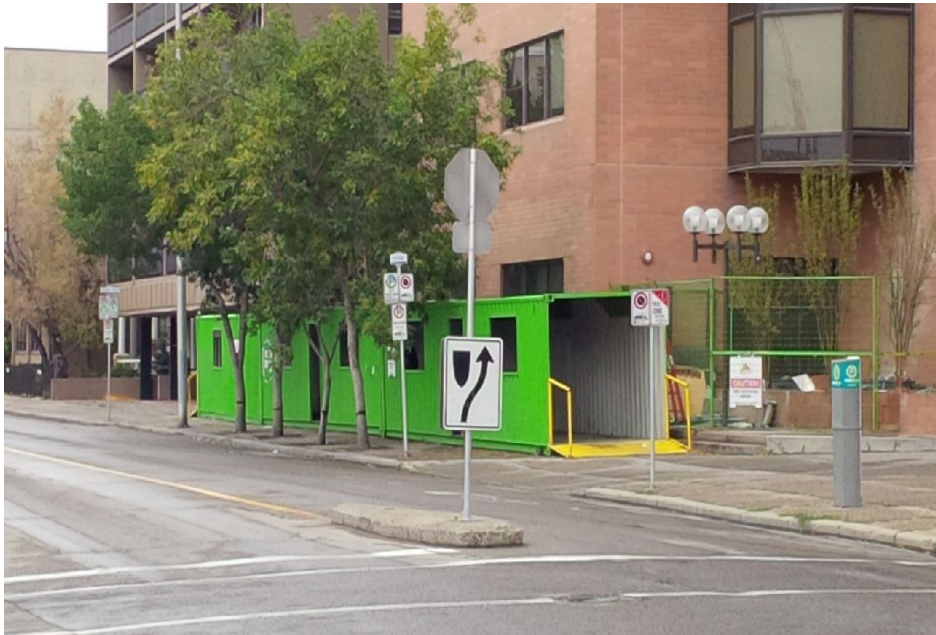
Application of SeaCan on Sidewalk along 10 Street at 8 Avenue
